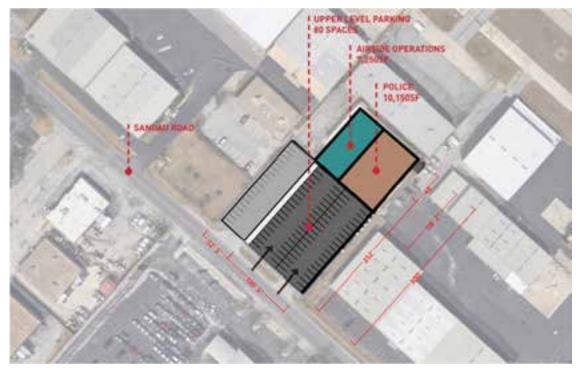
Proposed Public Safety Building Sub-Surface Parking Level
